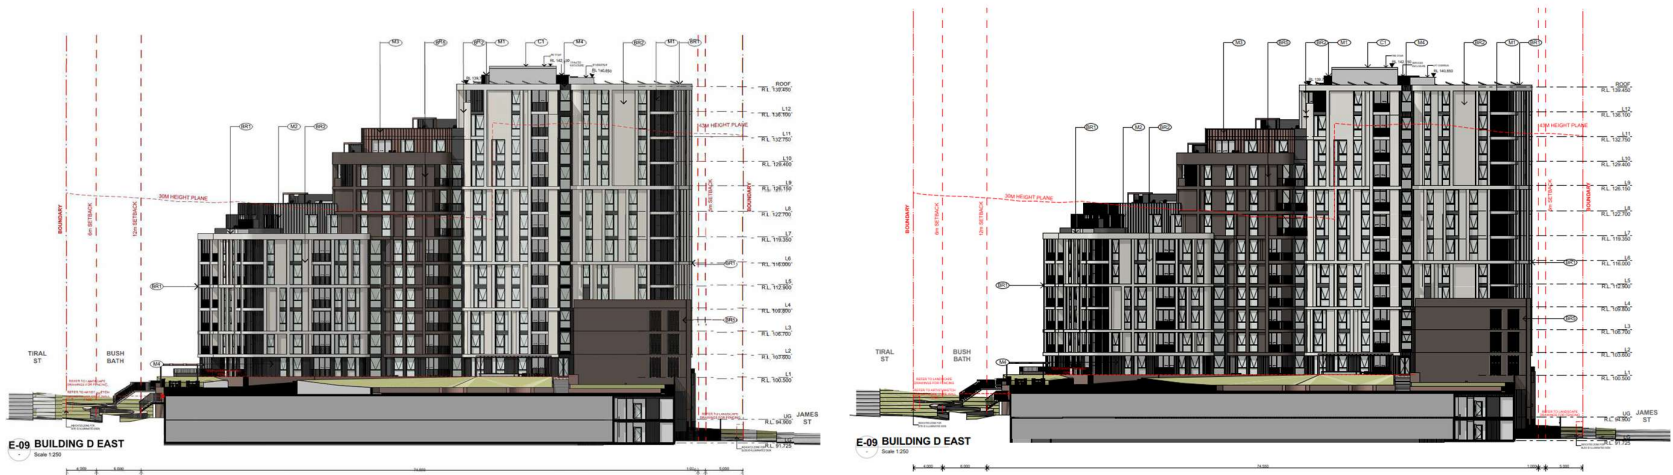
Approved and Proposed East Elevation of Building D (1 of 2)
